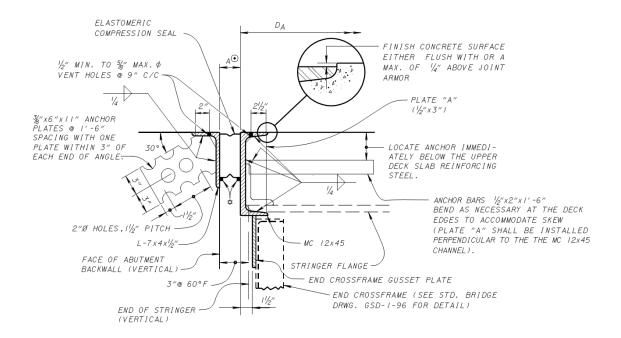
ODOT detail of compression seal joint (steel stringer bridge)
